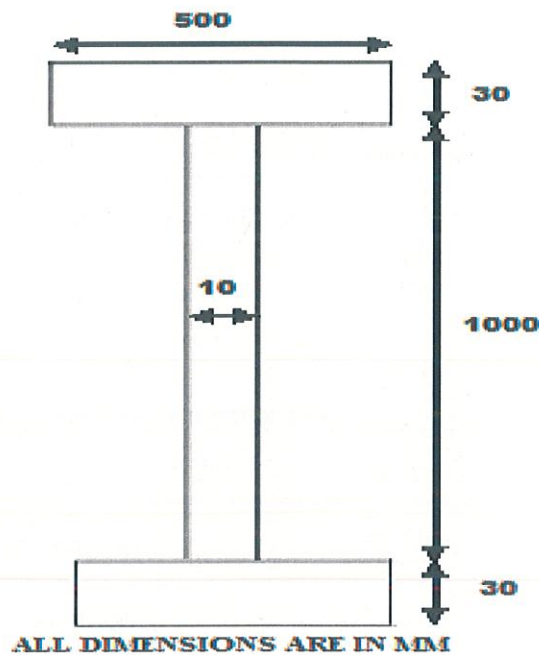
CROSS-SECTION OF PLATE GIRDER
